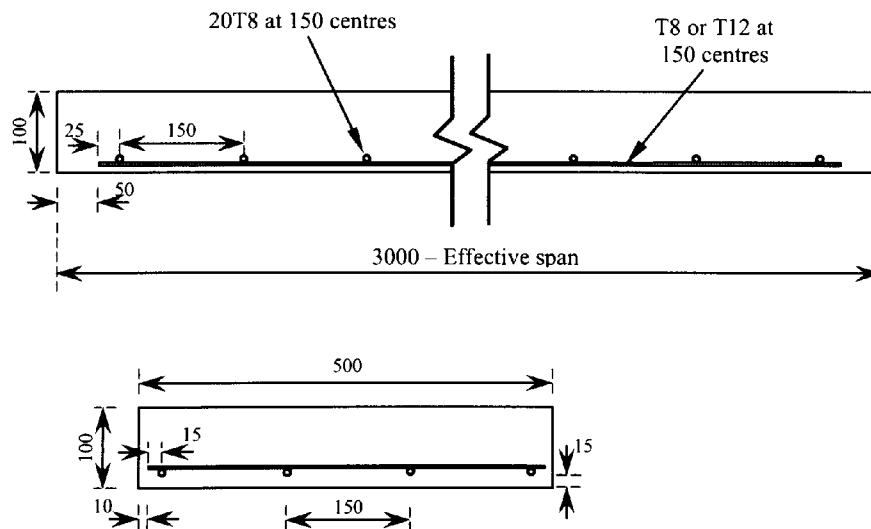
Slab dimensions and steel reinforcement arrangement
